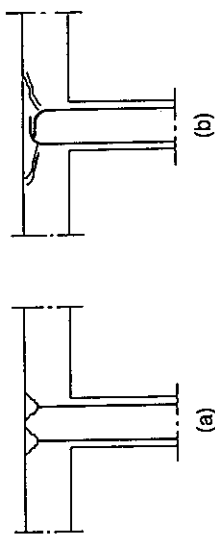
Possible damage caused by compression bars ending near concrete surface
